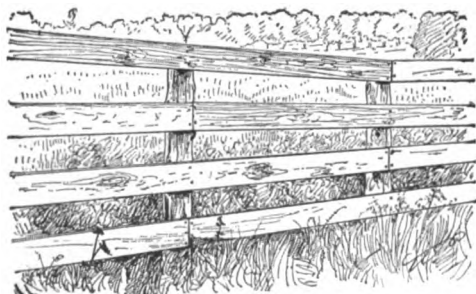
Section of well-built board fence showing broken joints and good spacing
